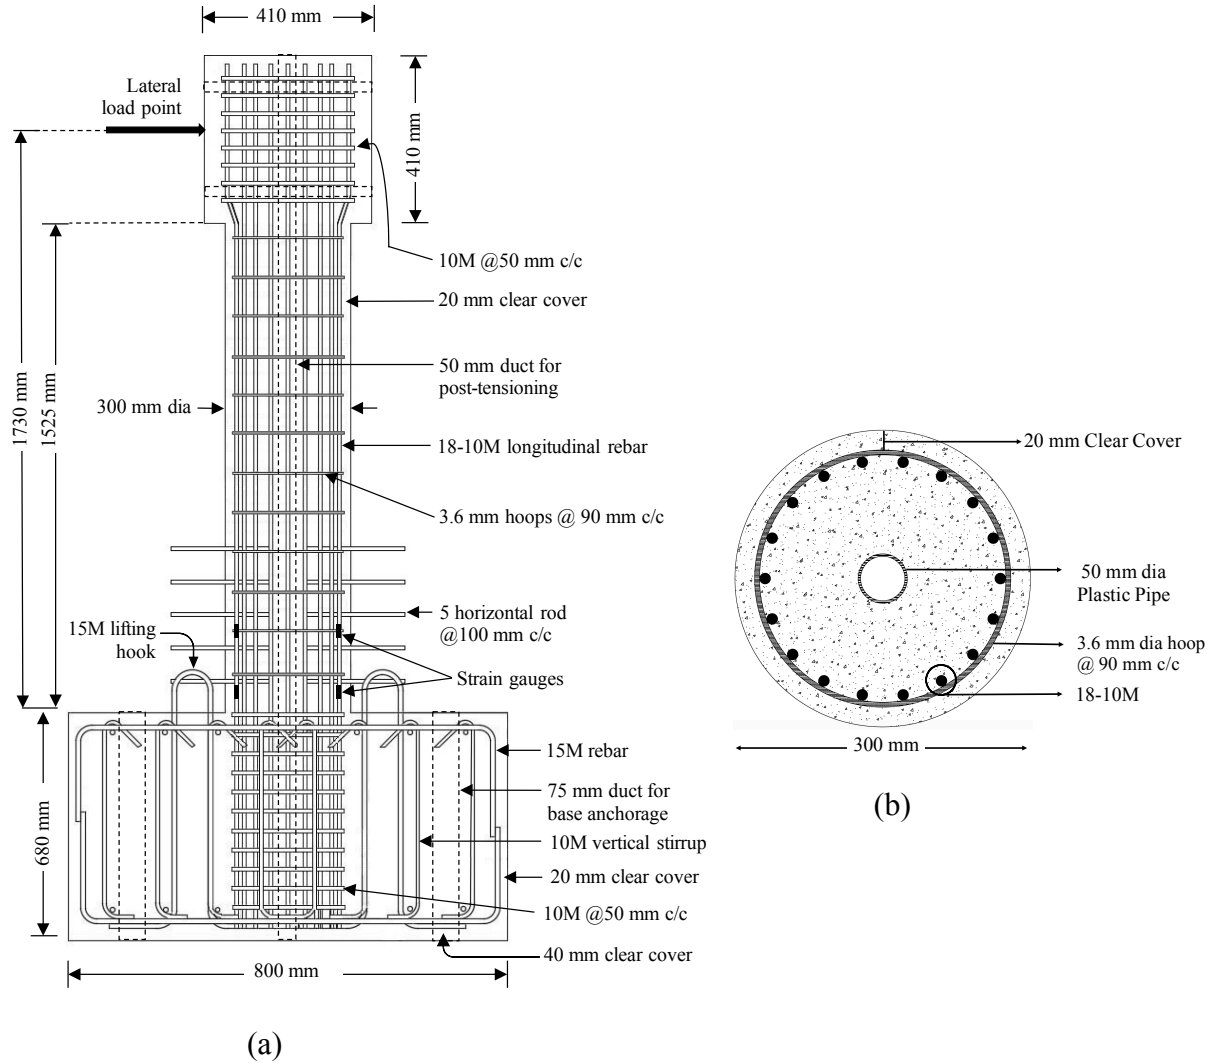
Specimen geometry and reinforcement layout: (a) reinforcement detailing; (b) cross-sectional detailing
